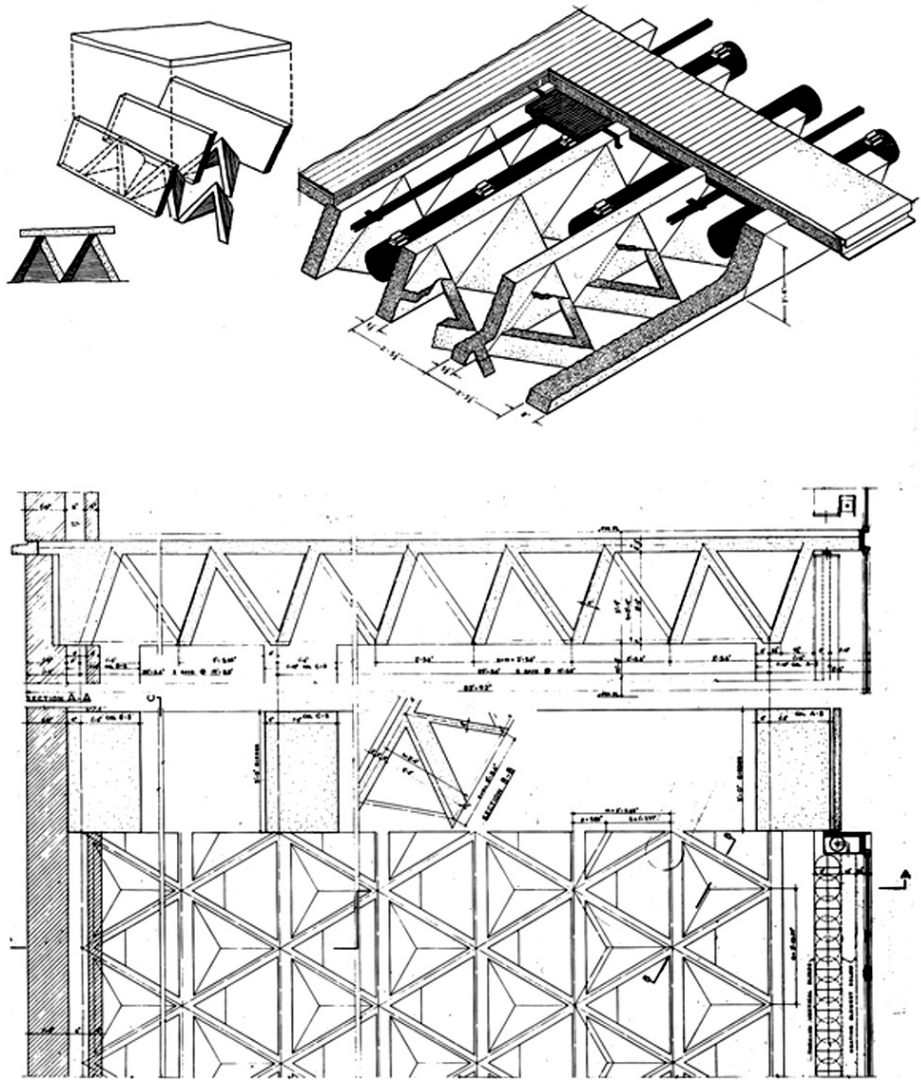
L. Kahn, Scheme of reinforced concrete slab, Yale Art Gallery, New Heaven 1974
